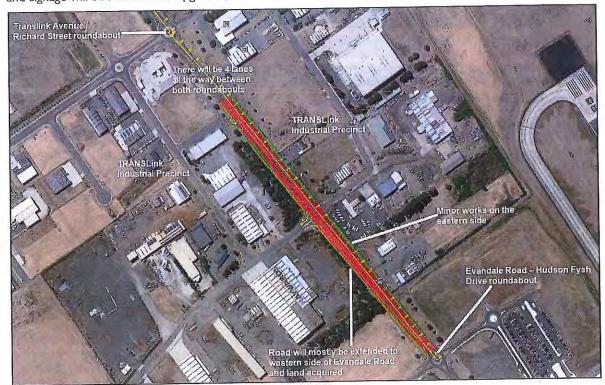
SOUTH-EAST SECTION OF THE ROADWORKS
